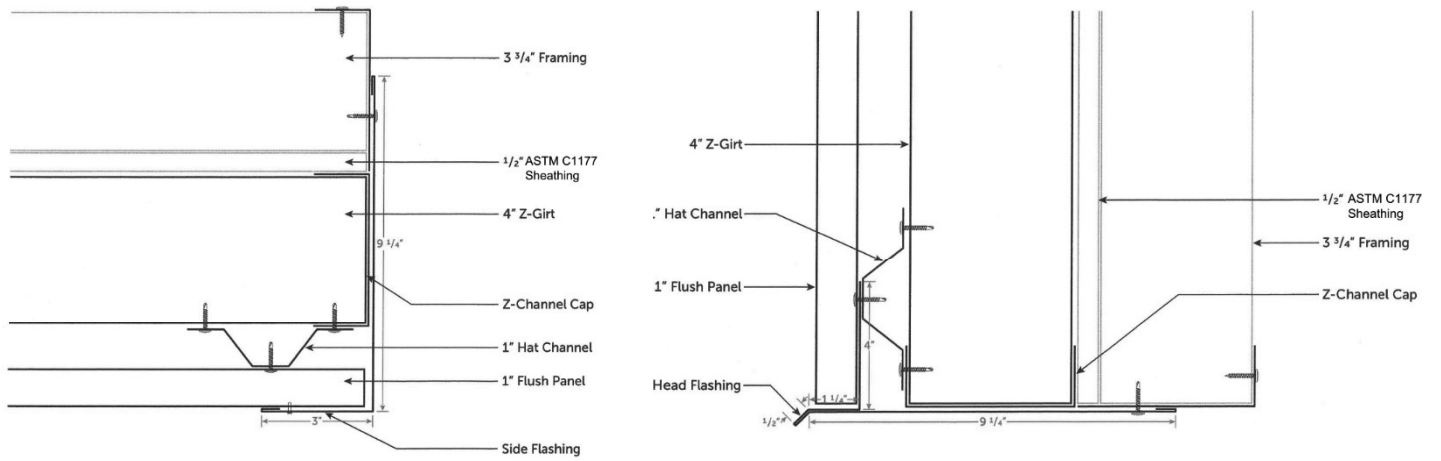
TABLE 3 (OPENING DETAILS)
